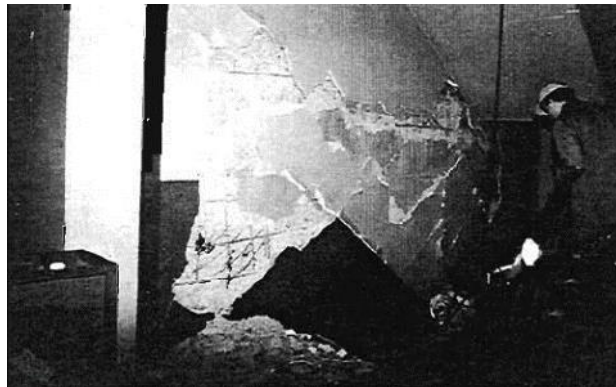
Kobe 1995: 11-story tower of German Consulate Building [132]
